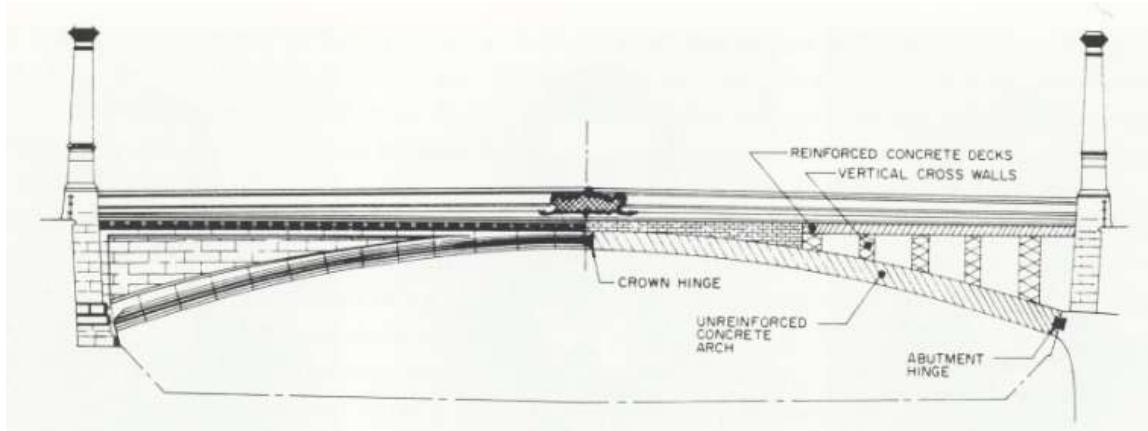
The Stauffacher Bridge’s three hinges [1]
